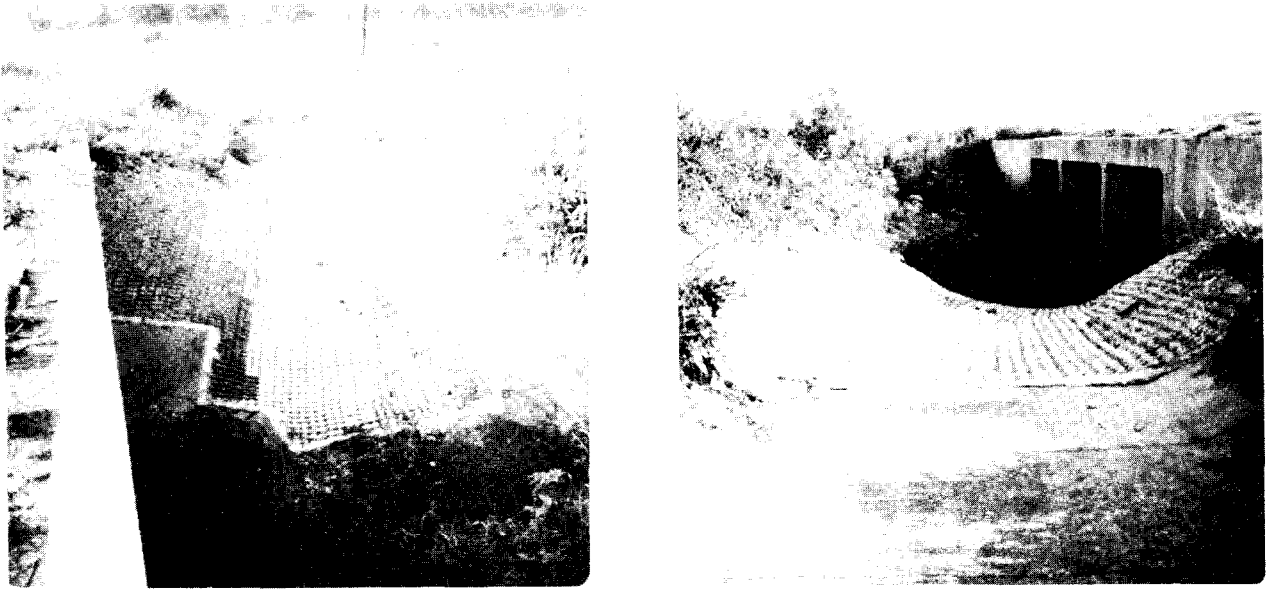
Two Views of a Drainage Chute Constructed with Cellular Concrete Paving Blocks. This is the same site shown in Figure 10. The chute drops the flow from a roadside ditch into a canal eight feet deep.
